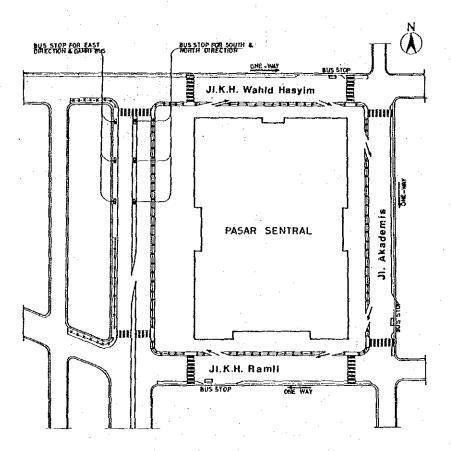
Pasar Sentral Sub Terminal Improvement Plan (Step 1)
